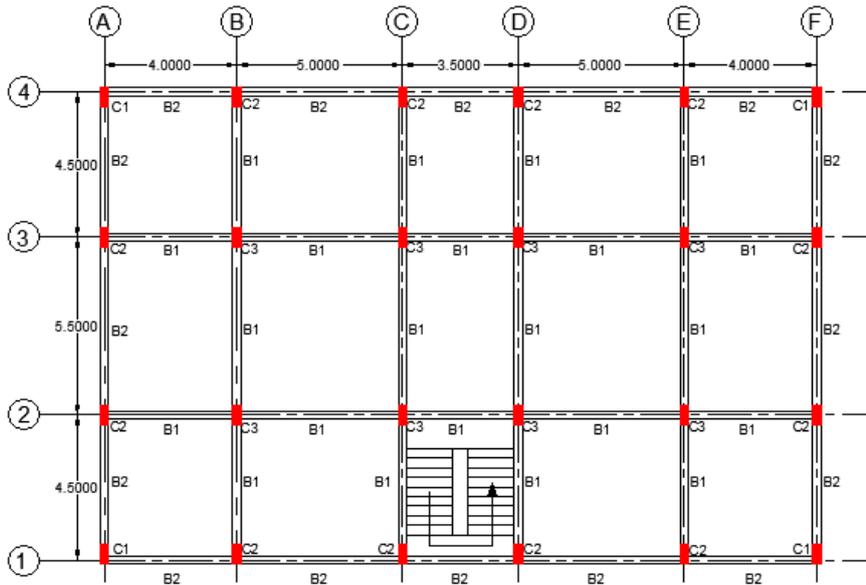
(a). Floor plan for G+4 storey regular RC frame.
